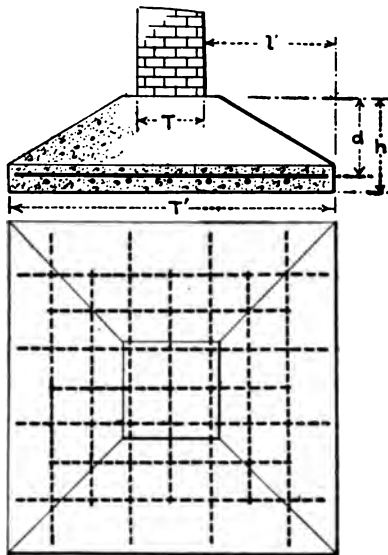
Typical Column Footing by Mr. E. L. Ransome.
